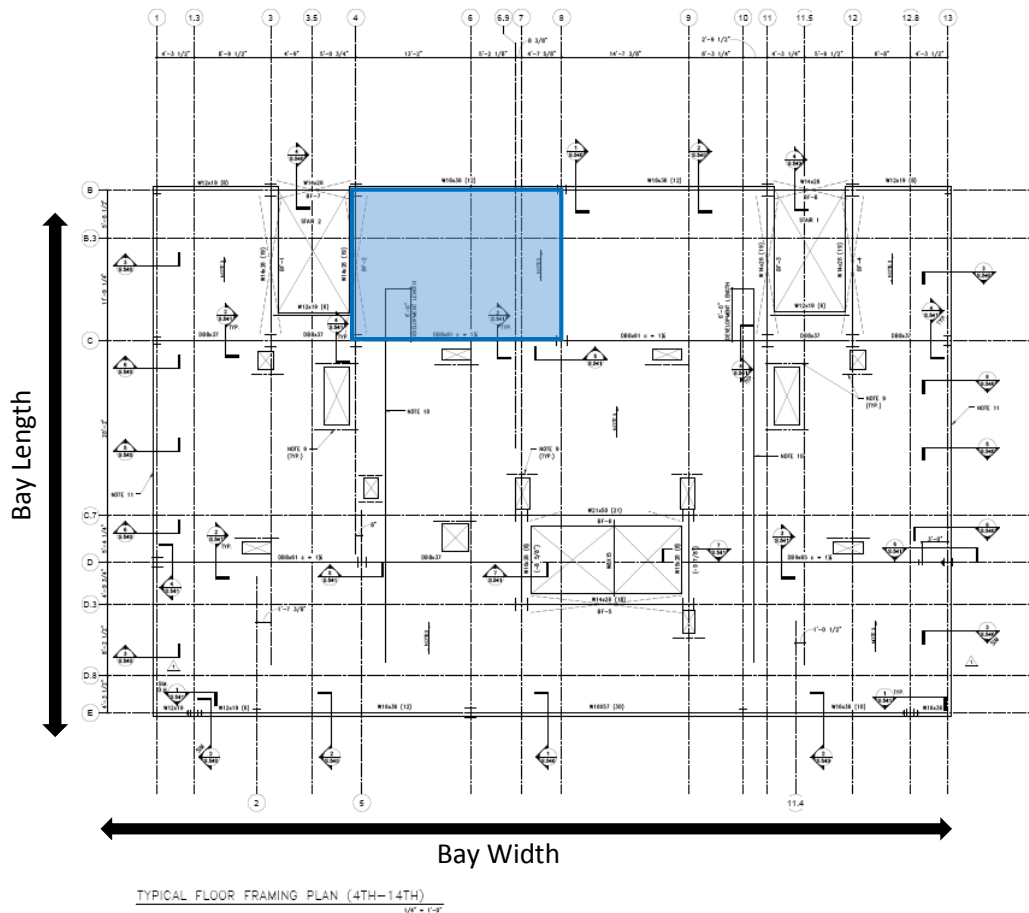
Typical Framing plan showing irregular structural grid. The average bay size (24'x17.5') is highlighted above.
